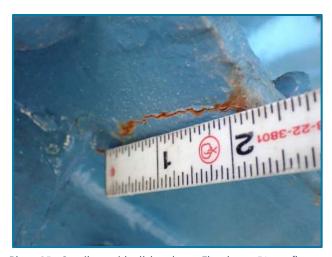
Cantilever sidealk bracket at Floorbeam 51, top flange with 1 3/4" long crack between Left Stringer 1 and Left Girder in Main Suspension Span (looking southwest). Note the arrest hole filled with caulk.
